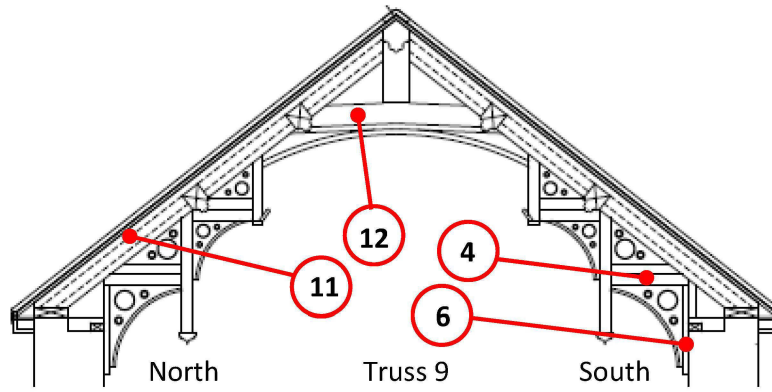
Sections through the nave roof trusses to locate sampled timbers
